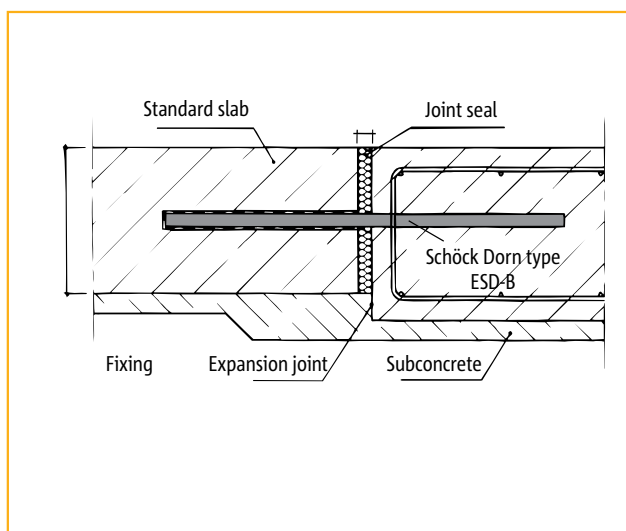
Connections for concrete carriageways to bridge structures (using approach slab construction)
